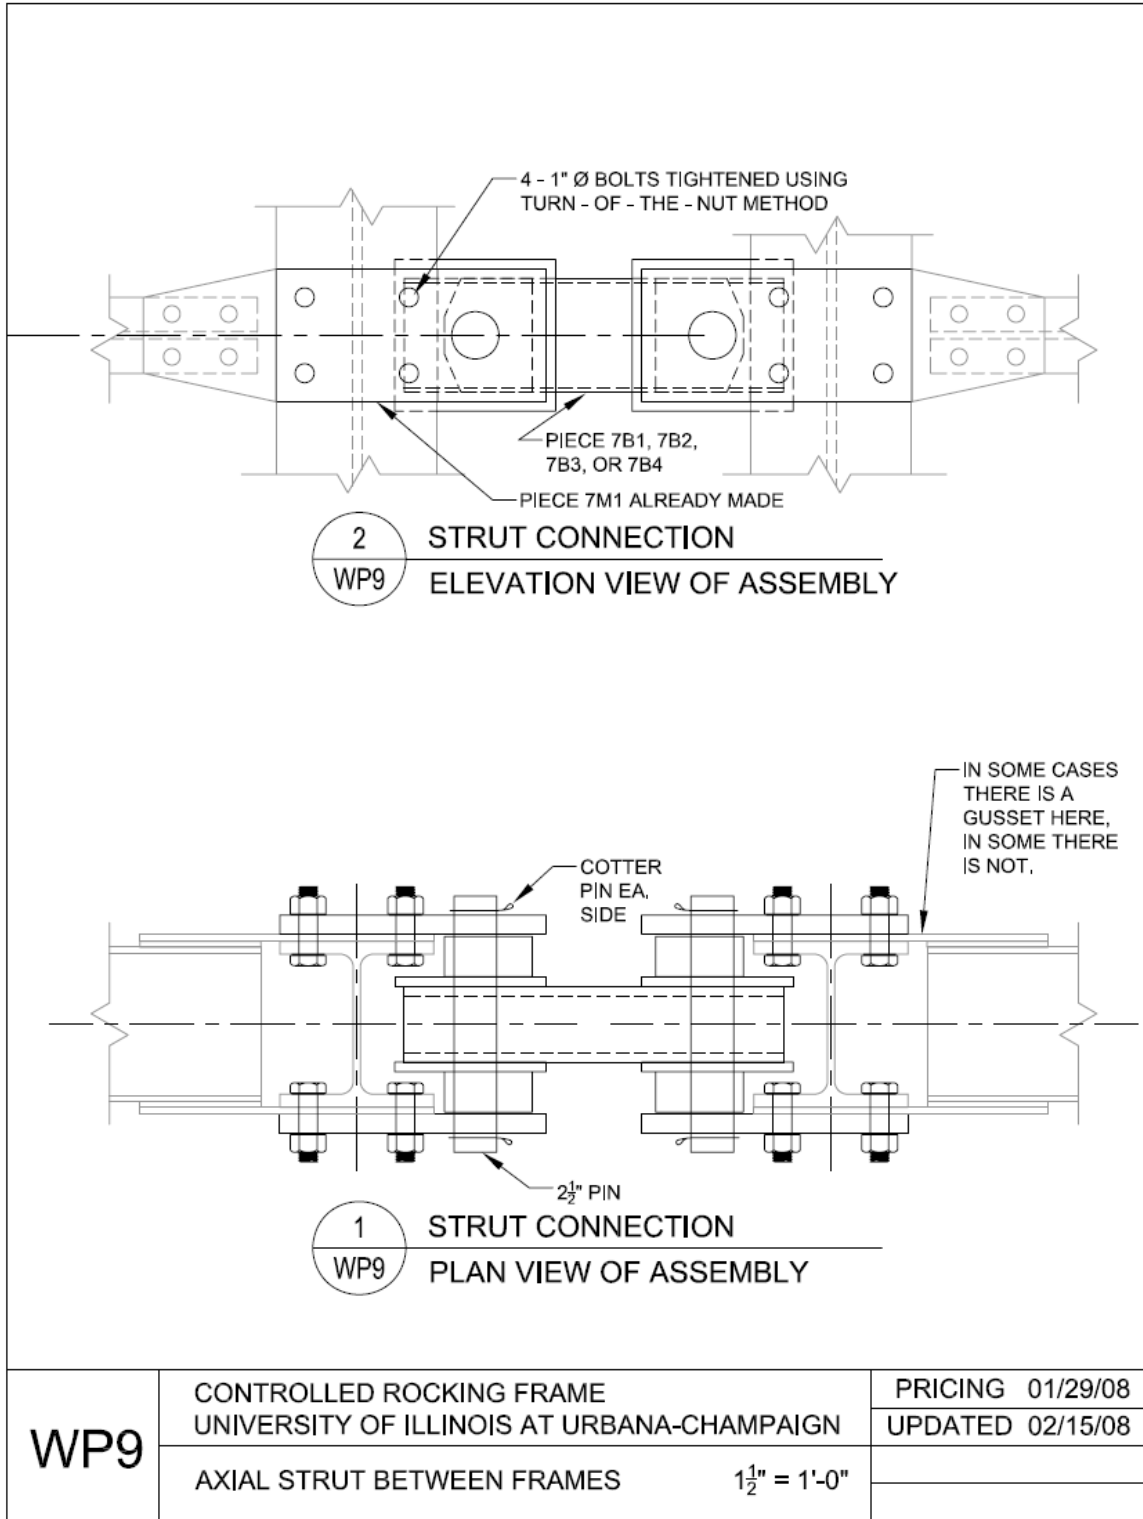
Work Plan Drawing – Axial Strut Between Frames
